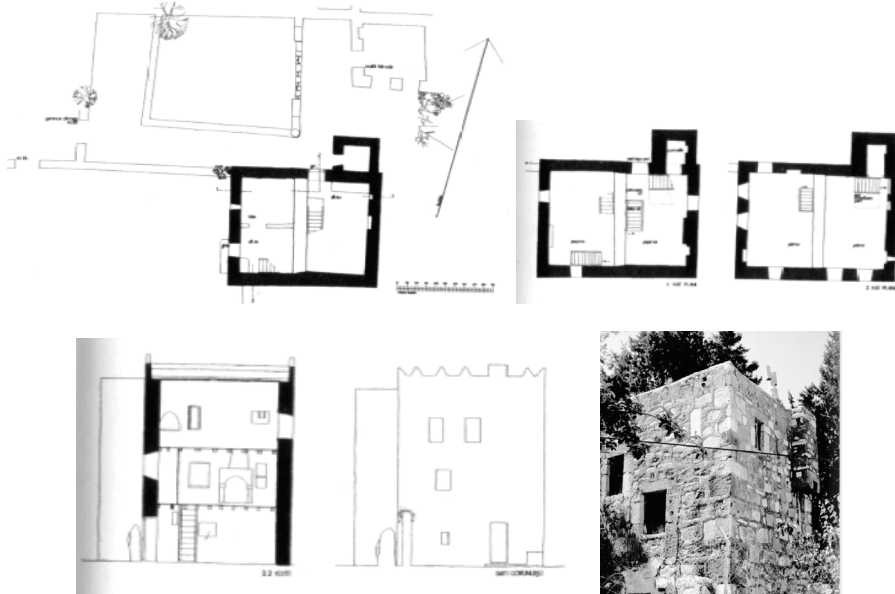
Tower House (plan,section,elevation Bektaş 2004, picture Gündüz and accom. 2001)
